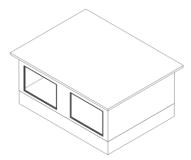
REVIT BIM MODEL - ROOF OVERHANG - 3D VIEW
